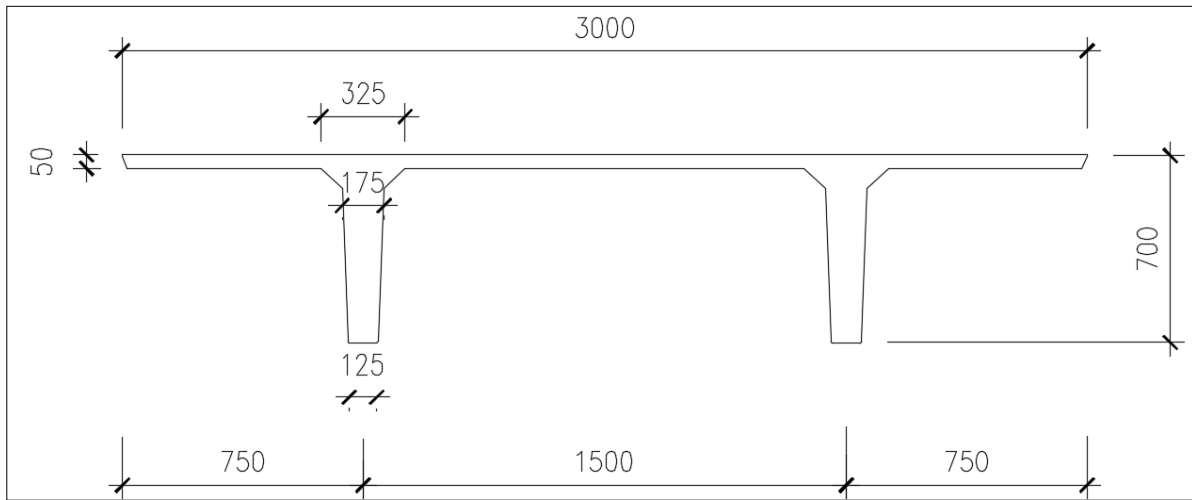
Proposed Sectional Geometry for Partially Precast Standard DT for Floor Members of Parking Structures for Indian Markets (all dimensions in mm)
